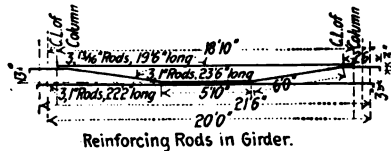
Girder Reinforcement, Chicago Store Building.
